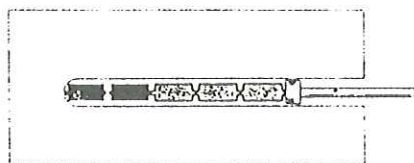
Williams Hollow Core expansion shell rebar rock bolt. After the expansion shell is anchored, the bolt is tensioned to the desired stress and then grouted. The grouting locks the stress in and minimizes corrosion (Courtesy Williams Ltd.).
